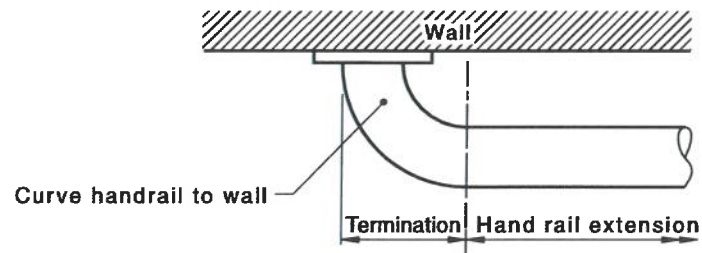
(A) — Ramp handrails - Examples of handrail terminations
